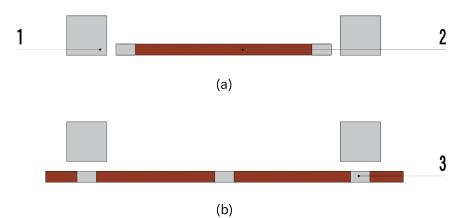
(a) Is a plan view of columns (1) either side of a separated infill (2) whose small columns at each end provide stability. In (b) the masonry wall with stabilizing columns (3) has been shifted from the structural columns so as not to impede their bending.
